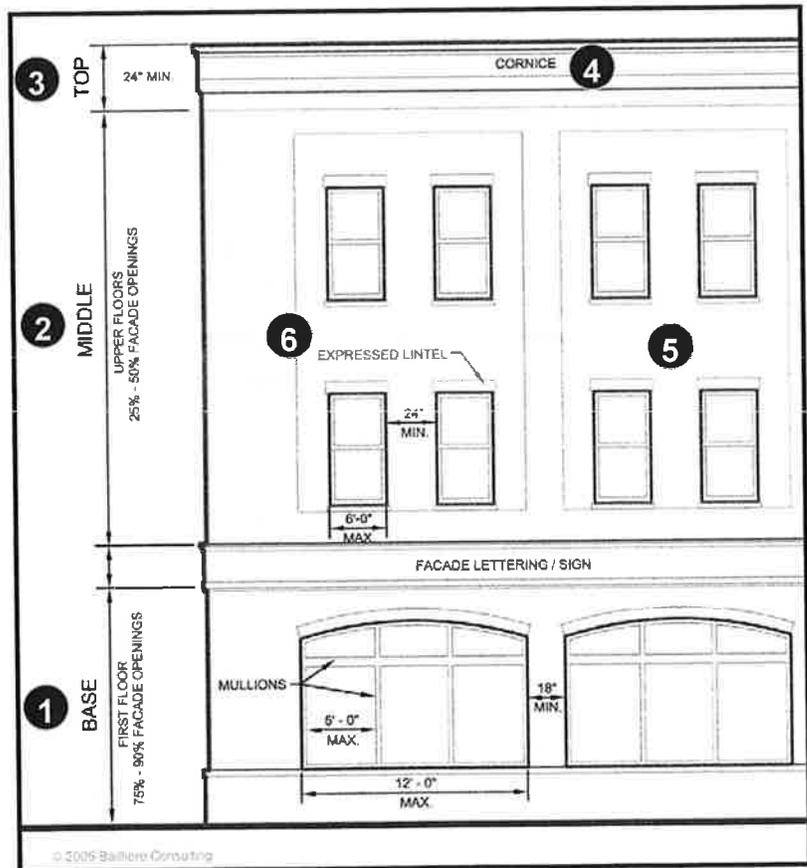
(above): New construction, especially at infill sites, should work to maintain the street wall and have a compatible façade composition with those buildings around it.
